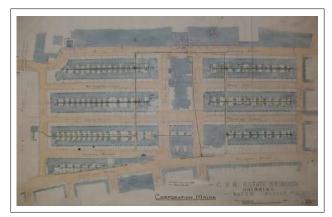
Plan of Swindon Railway Village designed by Brunel and constructed between 1842-1847 (STEAM, 2007).
